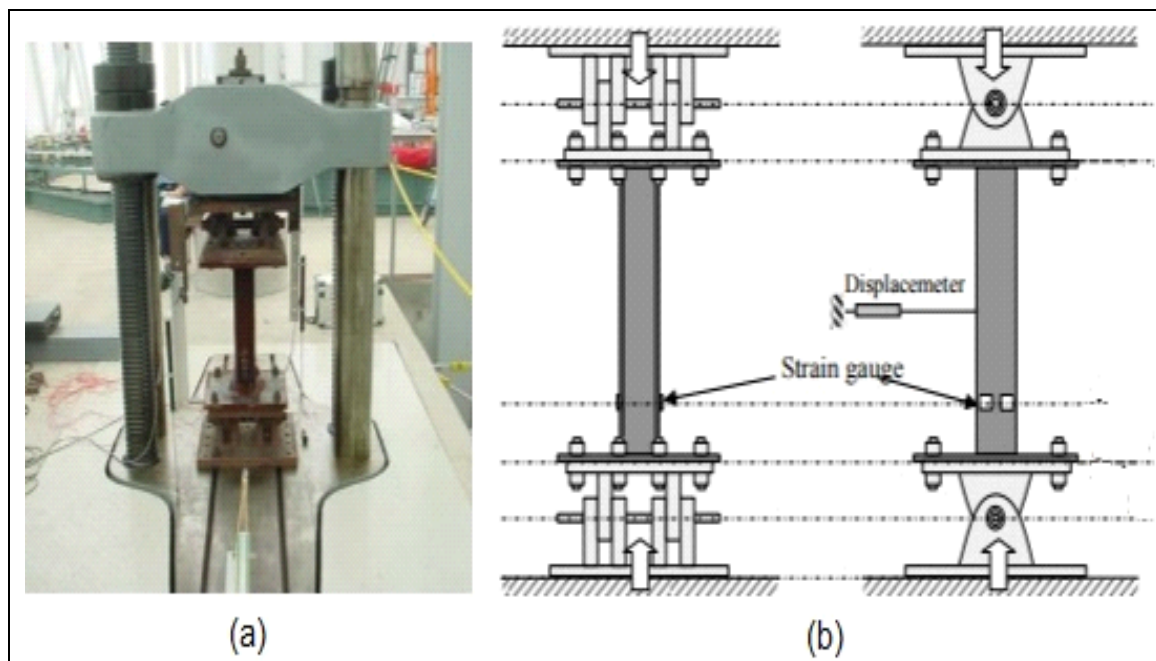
(a) Loading Test Set-up, (b) Overview of Specimen.
